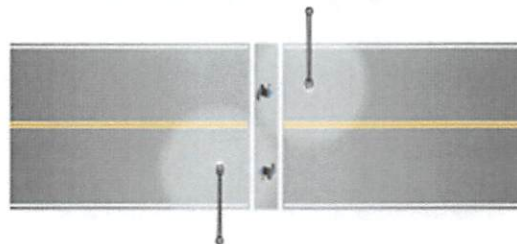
Drawing. New design for midblock crosswalk lighting layout.
